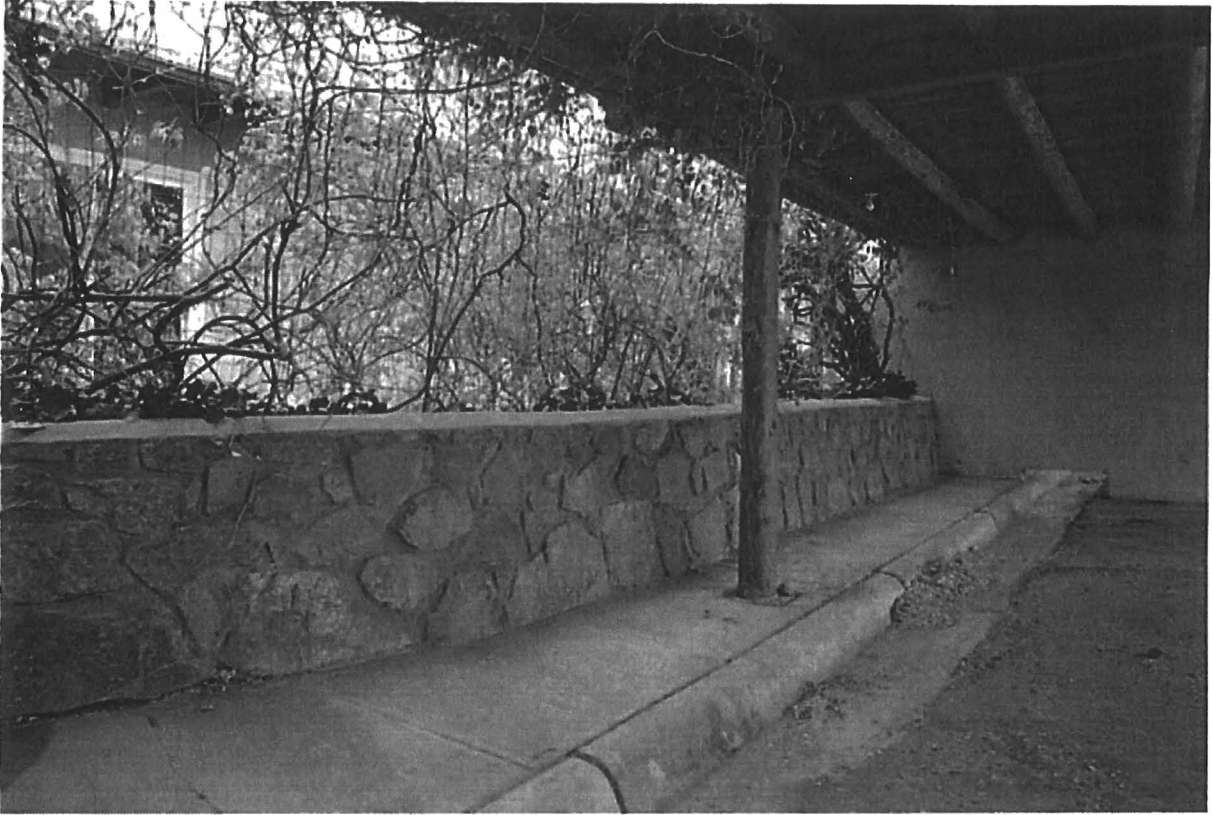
126 A Camino Santiago, Garage/Carport Structure, retaining wall, May 3, 2018.
